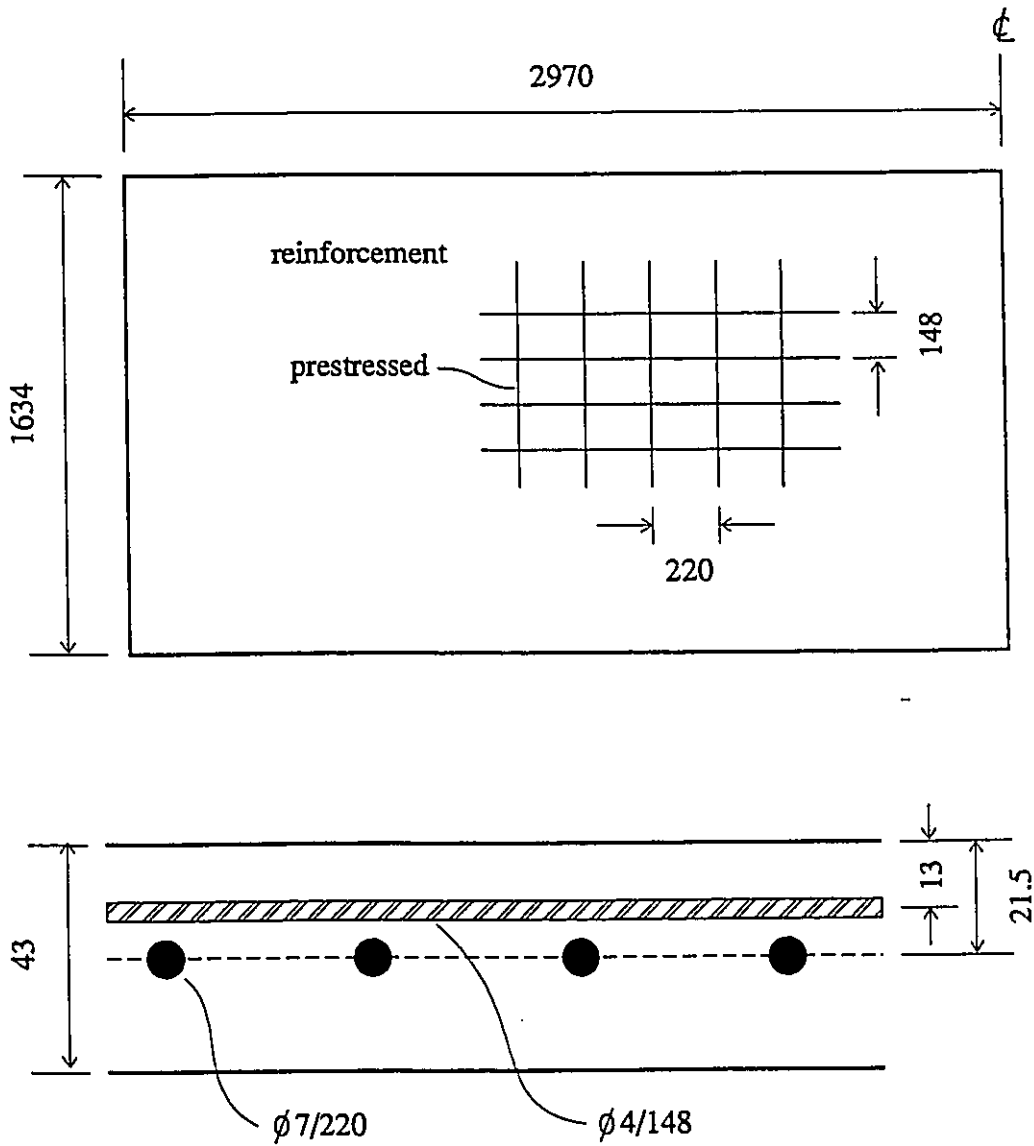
Placement of reinforcement for multigirder prestressed concrete slab (dimensions in mm).
